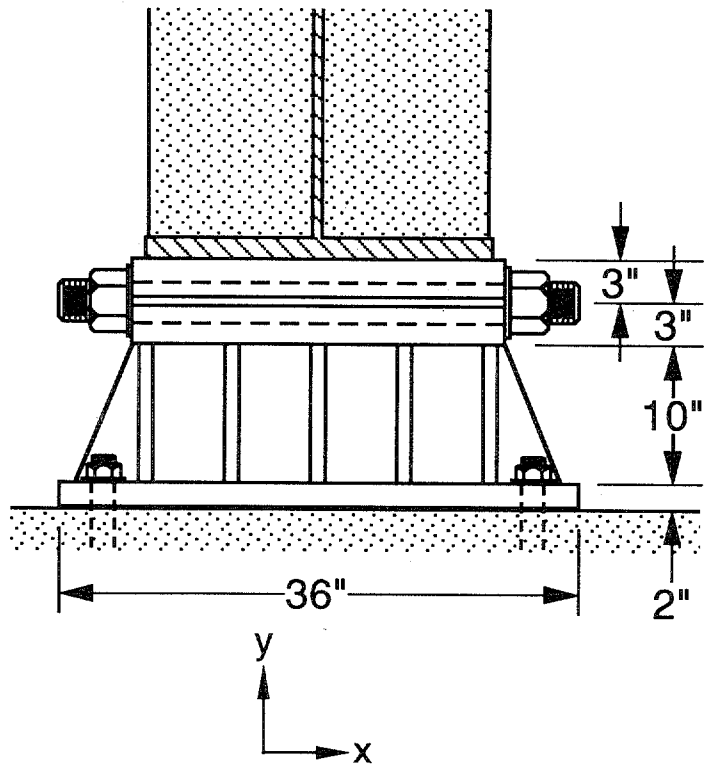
Connection detail found at Pier 1 that constrains longitudinal displacement.
